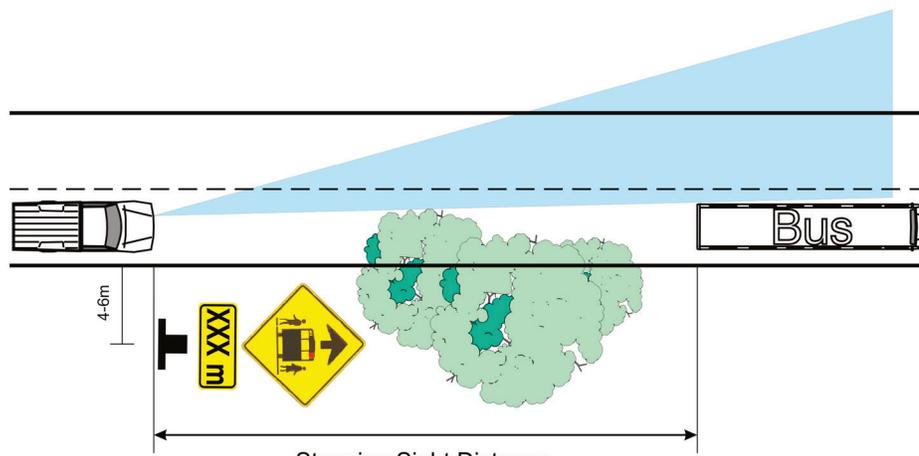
shows typical layouts illustrating the sign placement.
